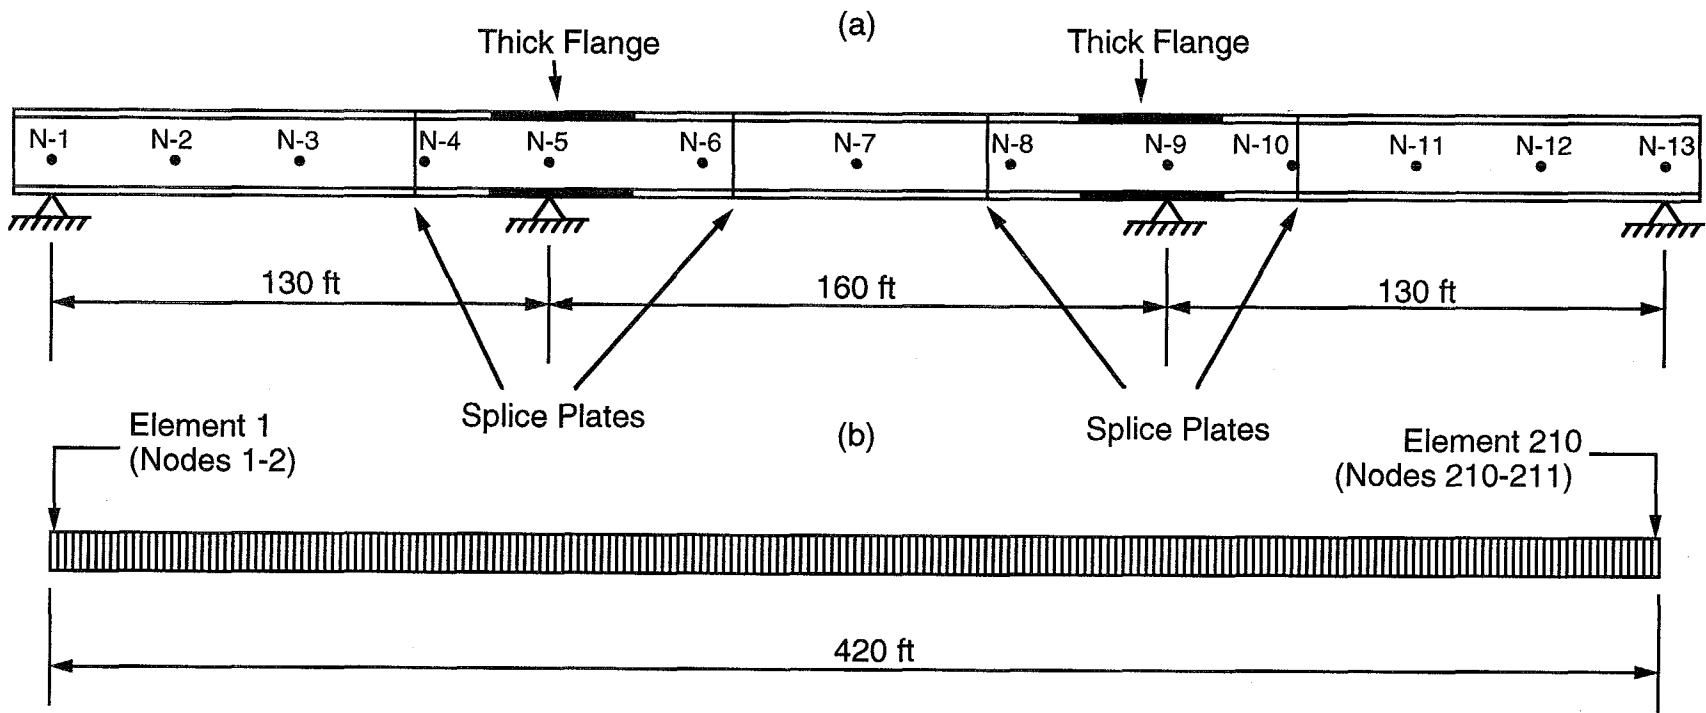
(a) Coarse set of accelerometer locations in experimental setup and (b) damage detection model of north damaged girder.
